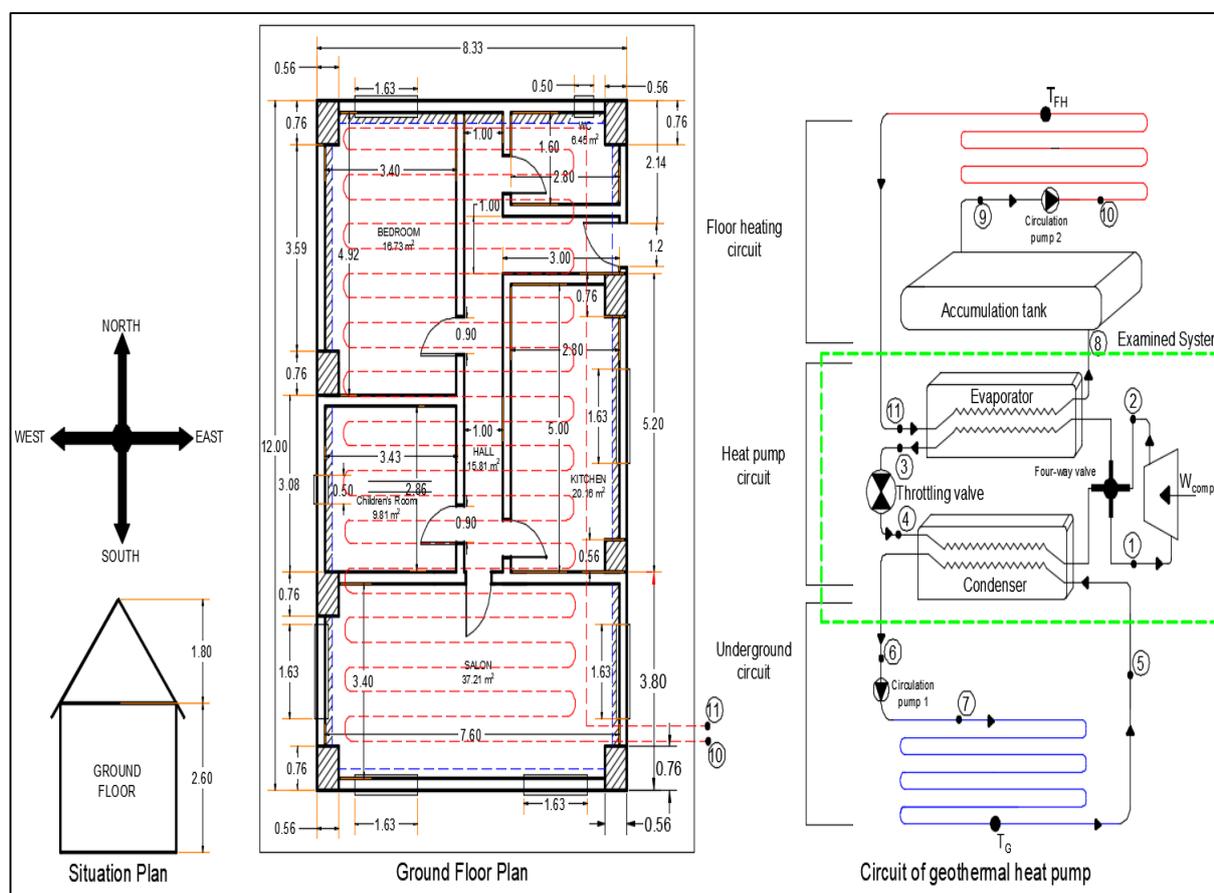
Floor plan of the examined building with circuit of geothermal heat pump.
